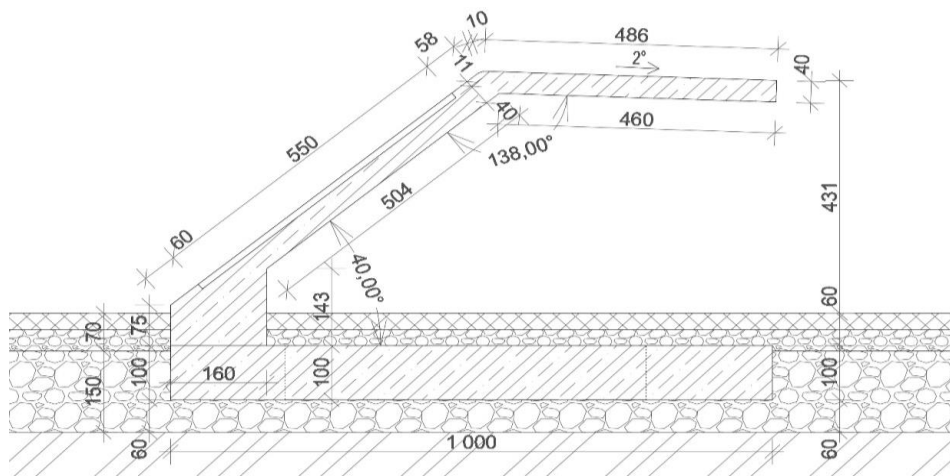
View on cross-sectional drawing of bench with dimensions [13].
